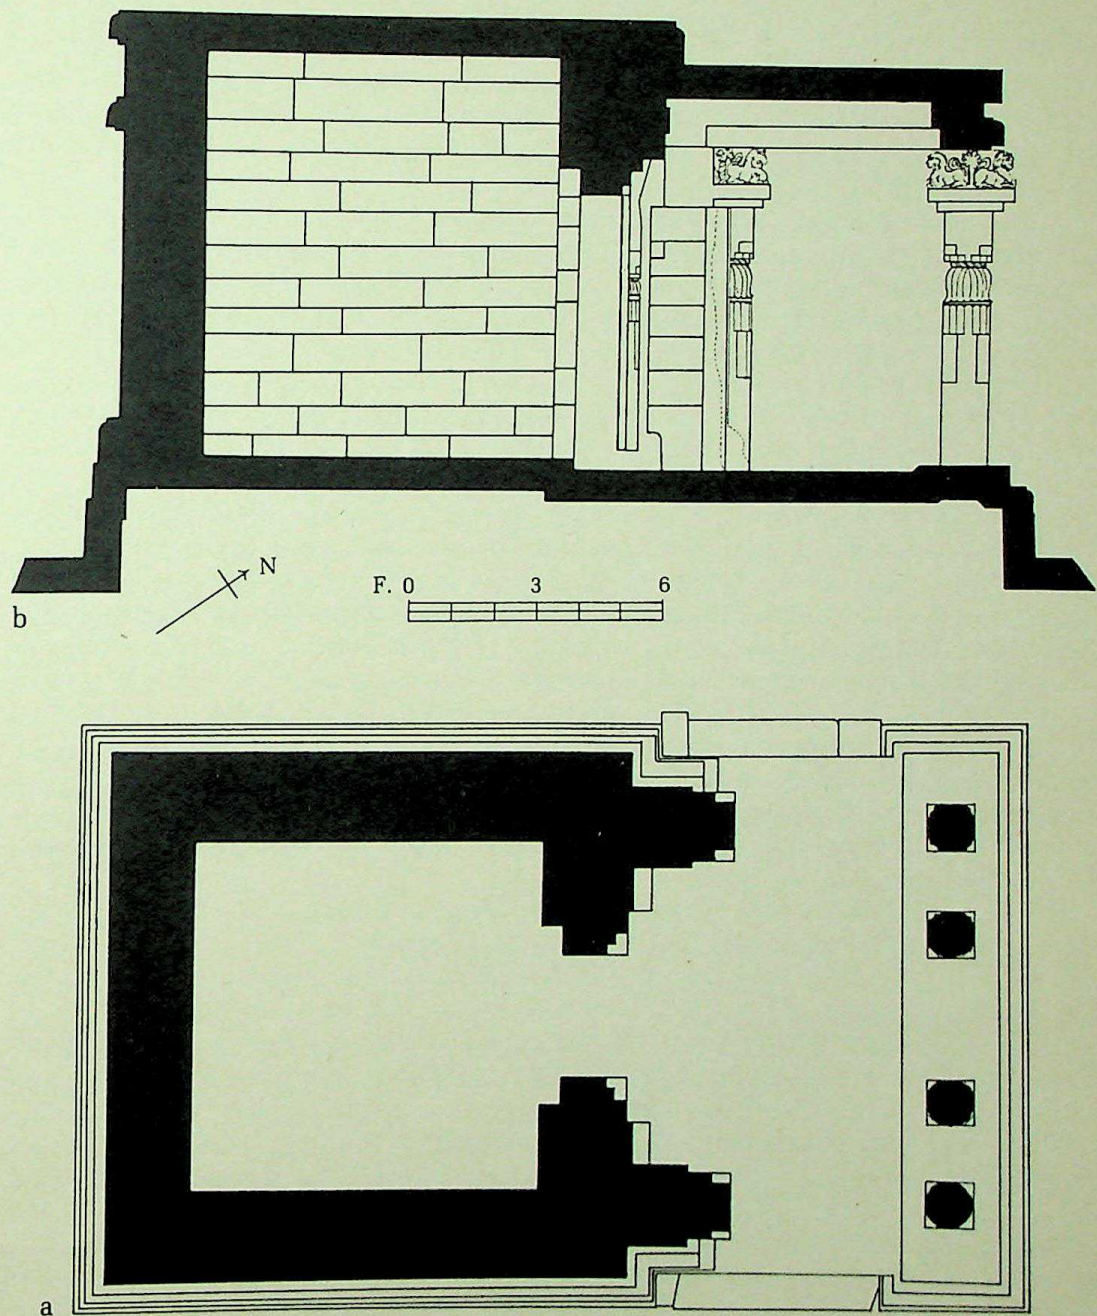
Sanci Temple no. 17: a. plan; b. section.
